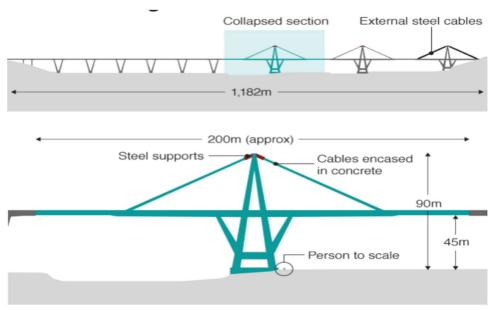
Section of the bridge that collapsed [13]
